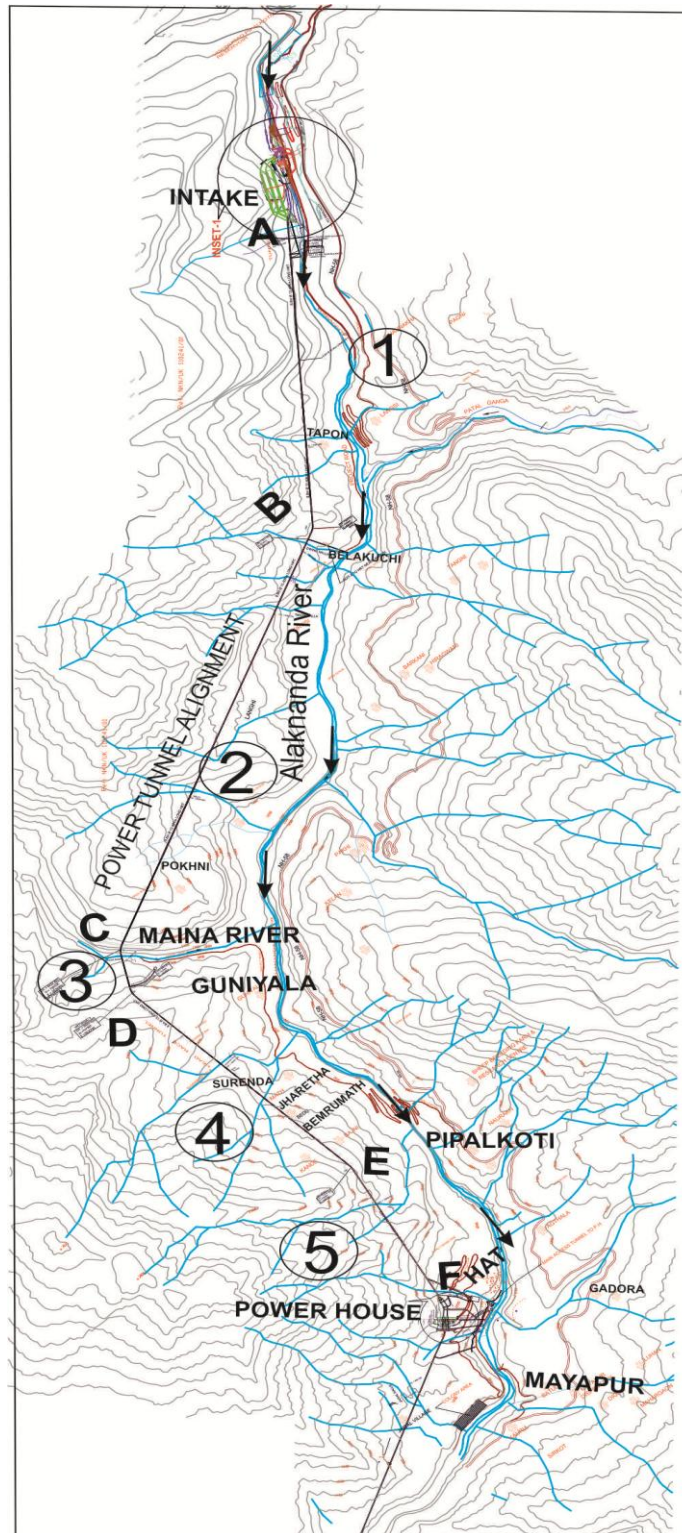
Layout map of the Vishnugad–Pipalkoti HEP showing the power tunnel alignment along the right bank of Alaknanda river
